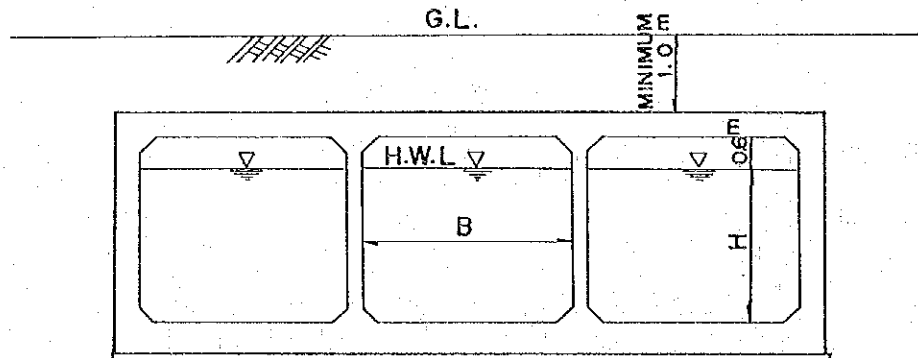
(1/2) STANDARD DRAWING OF RIVER CROSS SECTION
